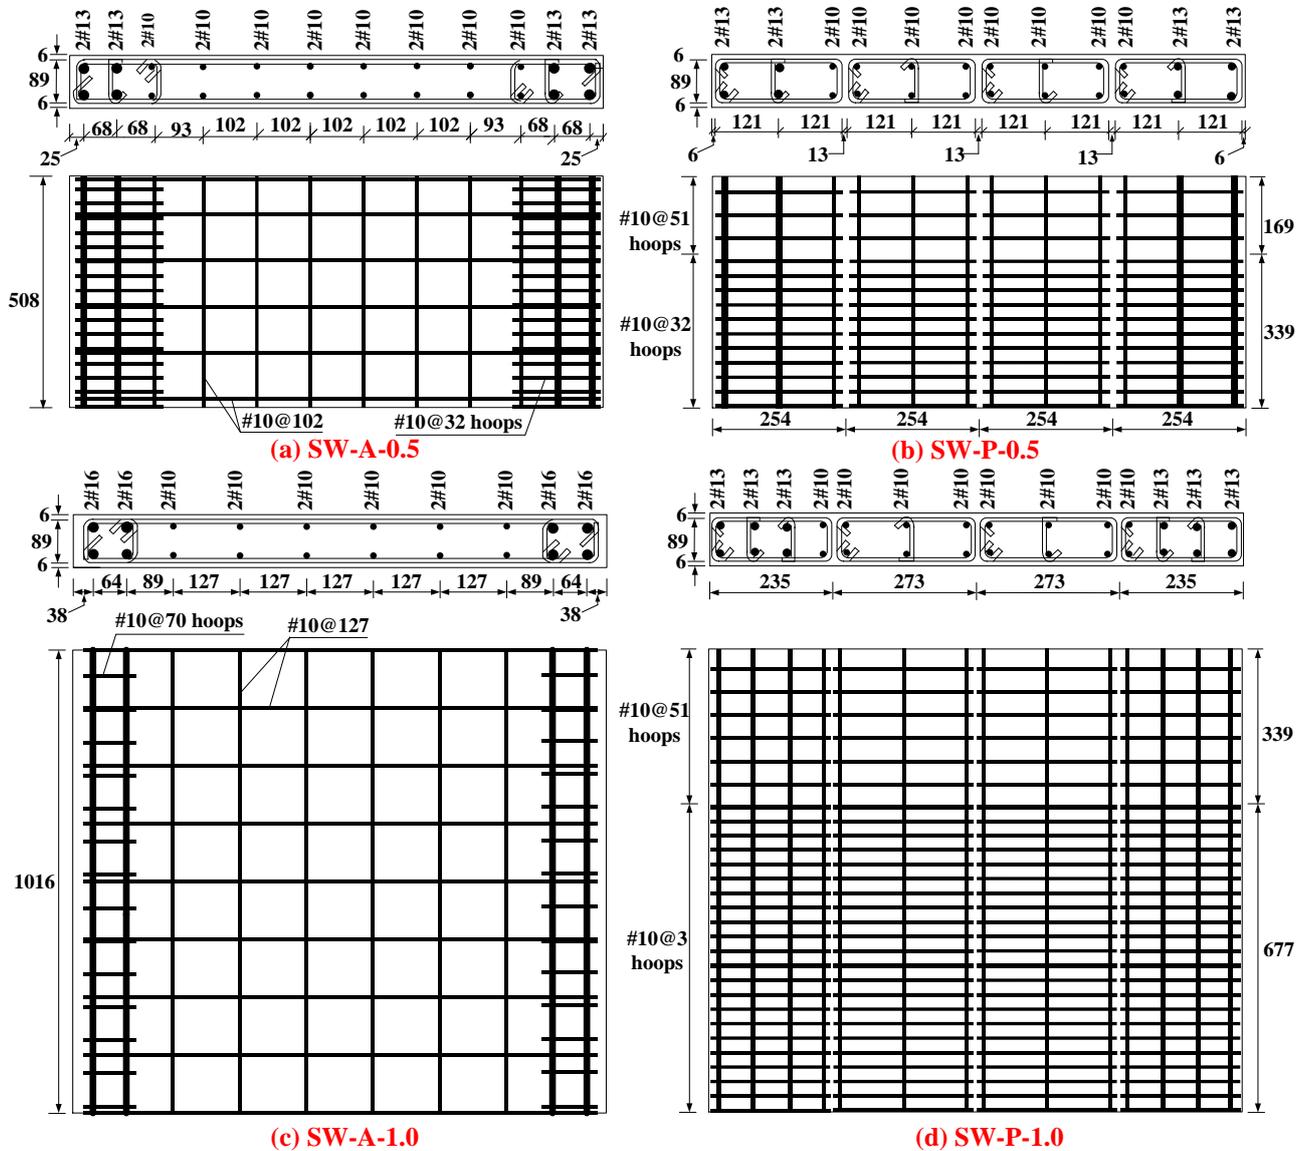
Specimen reinforcement details (units: millimeter). All bars sizes are in metric size.
